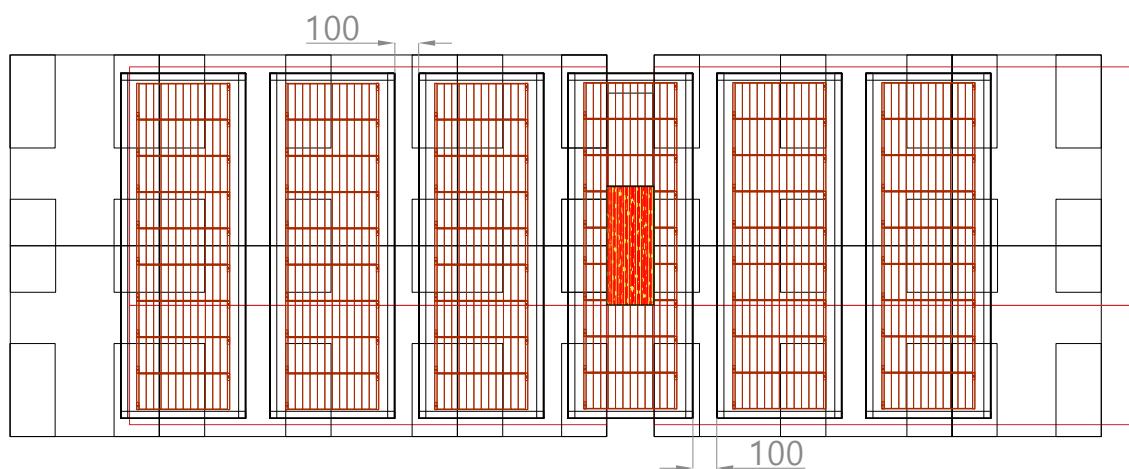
Installation of 6 battery boxes/cases under floor or ceiling
